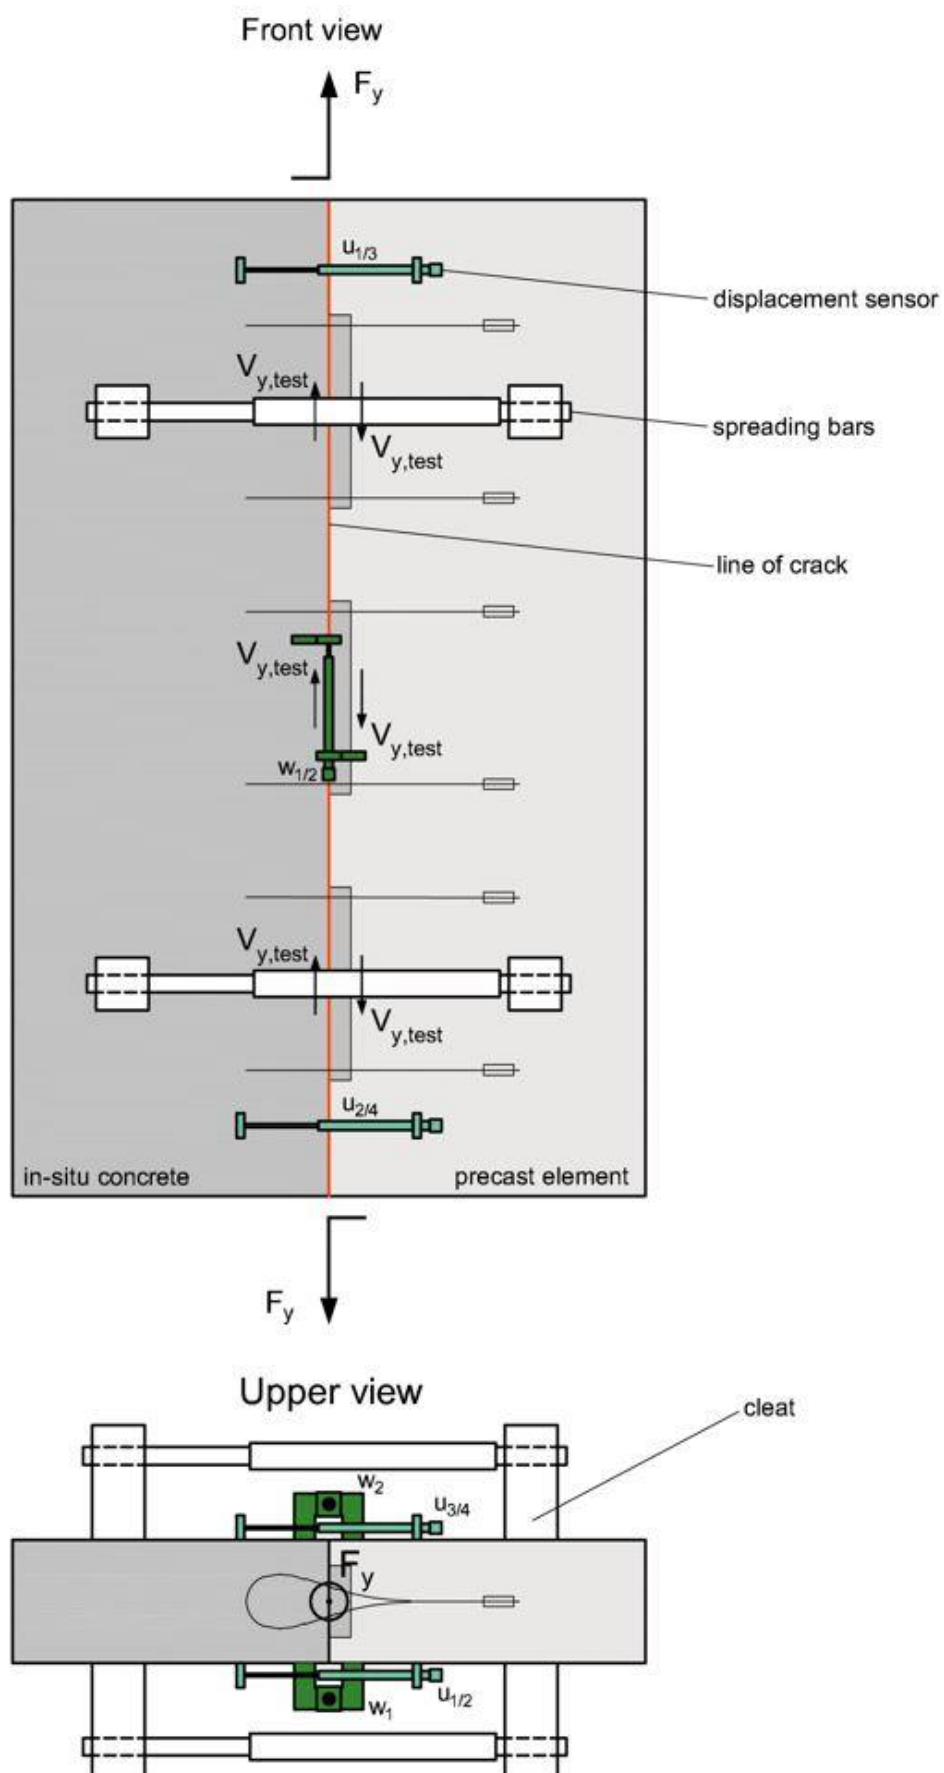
Test setup for connections with in-situ concrete elements
